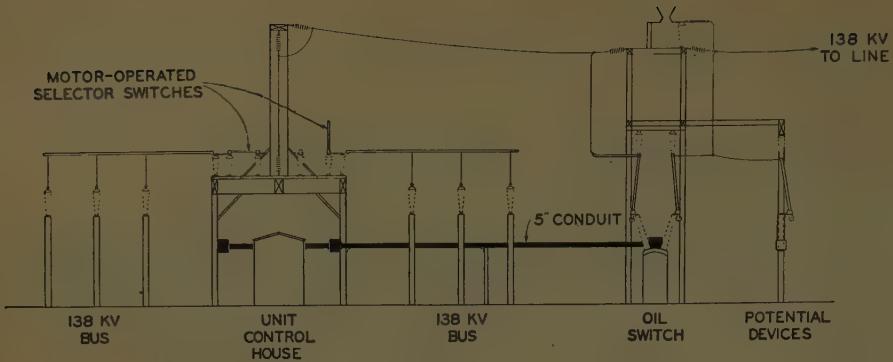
Cross section of 138-kv substation with unit control houses and overhead conduit
